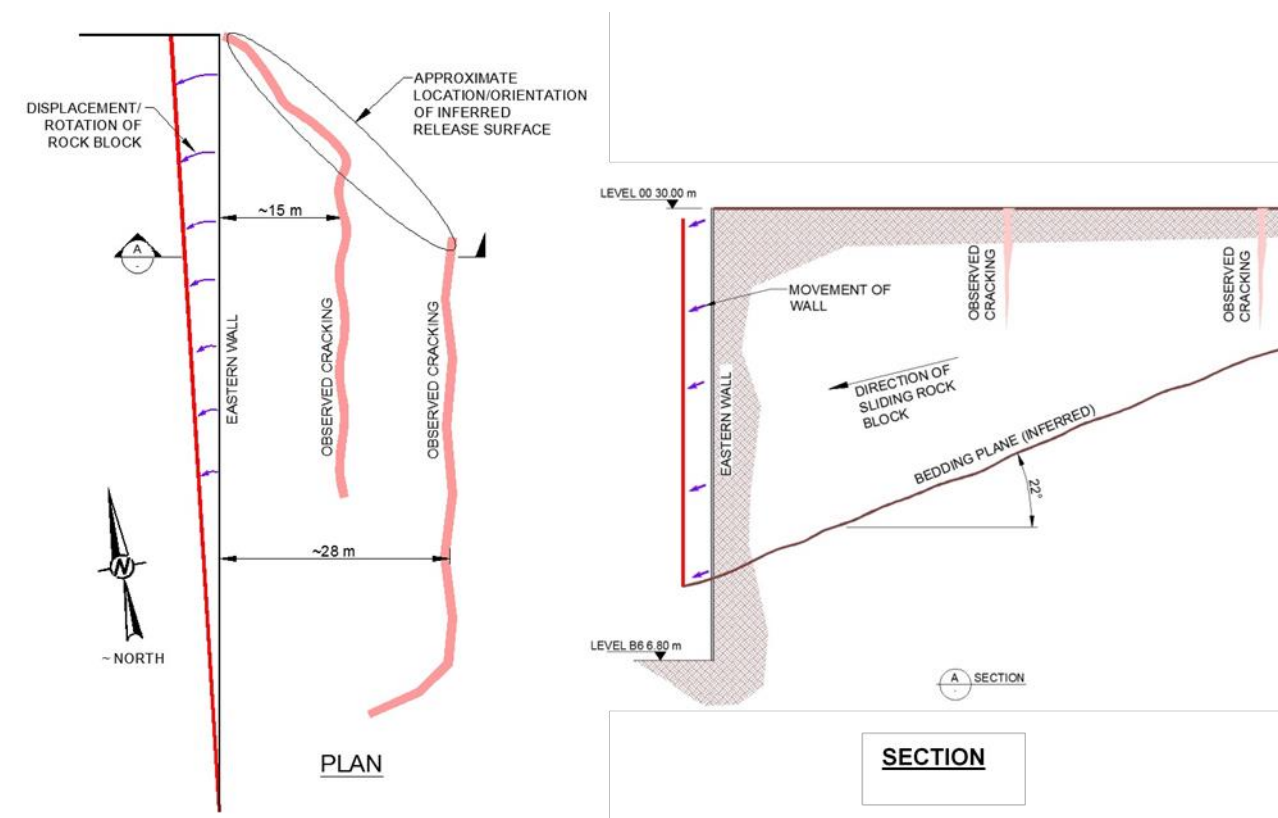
Mechanism of movement of east wall (plan, left and section, right)
